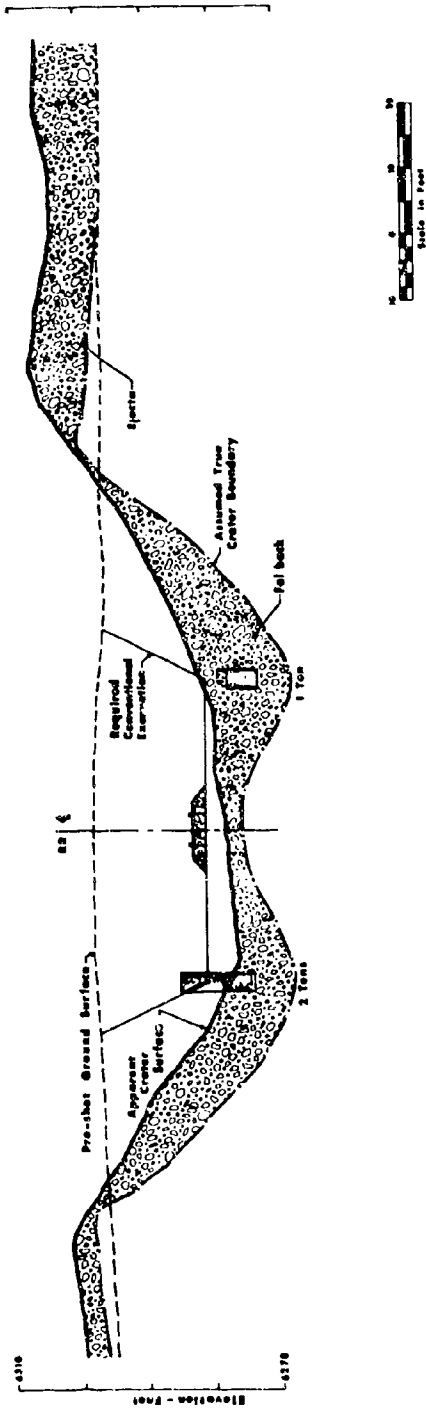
Typical Cross Section of Trinidad Railroad Cut
